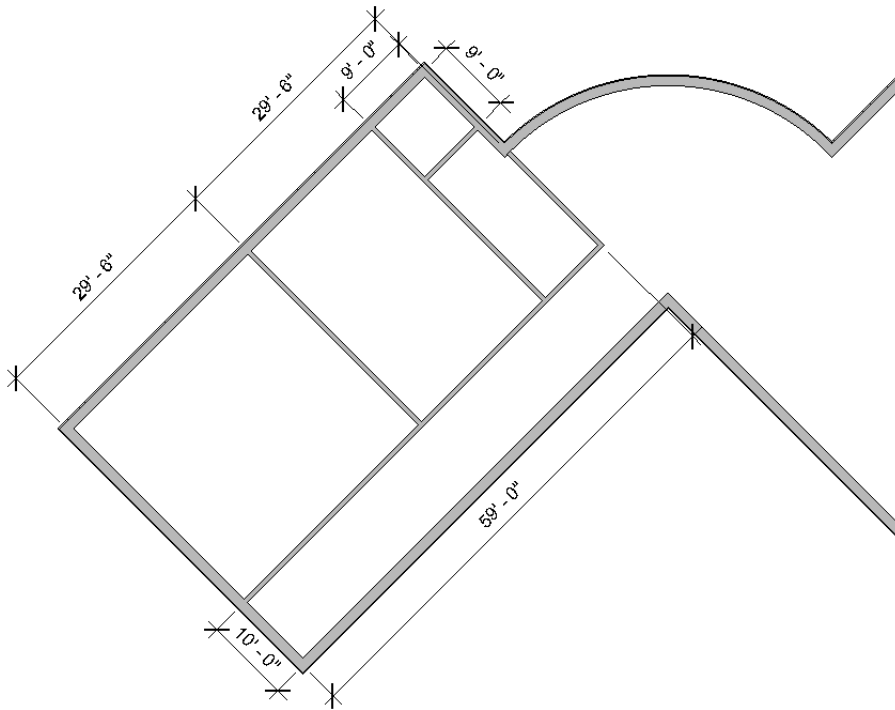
Sketch plan for creating the interior wall of the left portion of the Club project
